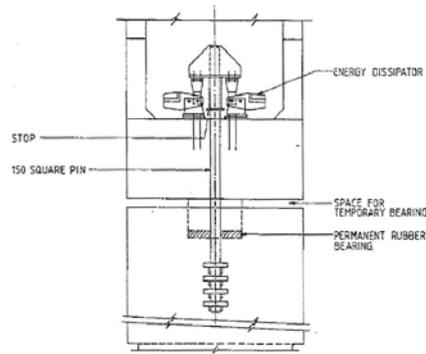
SOUTH RANGITIKEI PIER BASE DETAIL.
